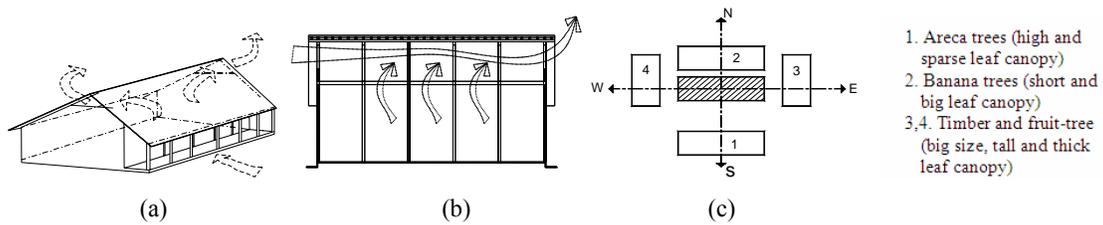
(a) Ventilation in open façade; (b) Ventilation through two air-holes lengthwise section; (c) Planting green tree principle around house
